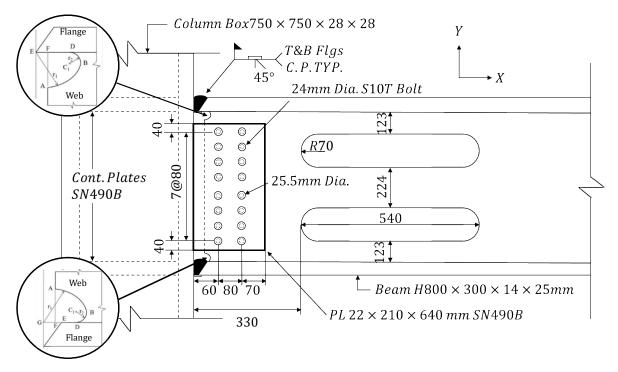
Details of the studied RWS connection with two horizontal long openings (Chang et al., 2022)
